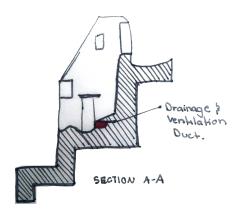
The drawing shows a cross-section of a wall structure, highlighting drainage and ventilation canals. Drawn and annotated by the author, based on Jean-Pierre Protzen (2005, fig 5.5).
